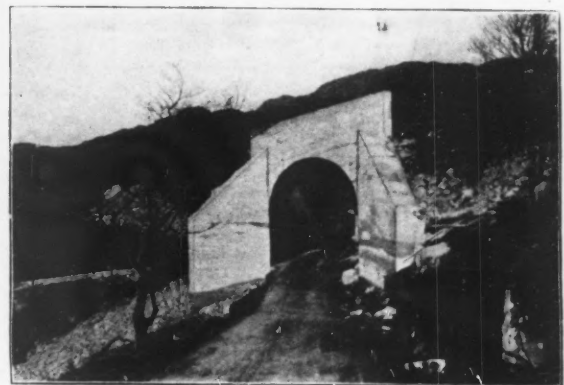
SKEW CONCRETE BRIDGE, NEAR POLNISH.
